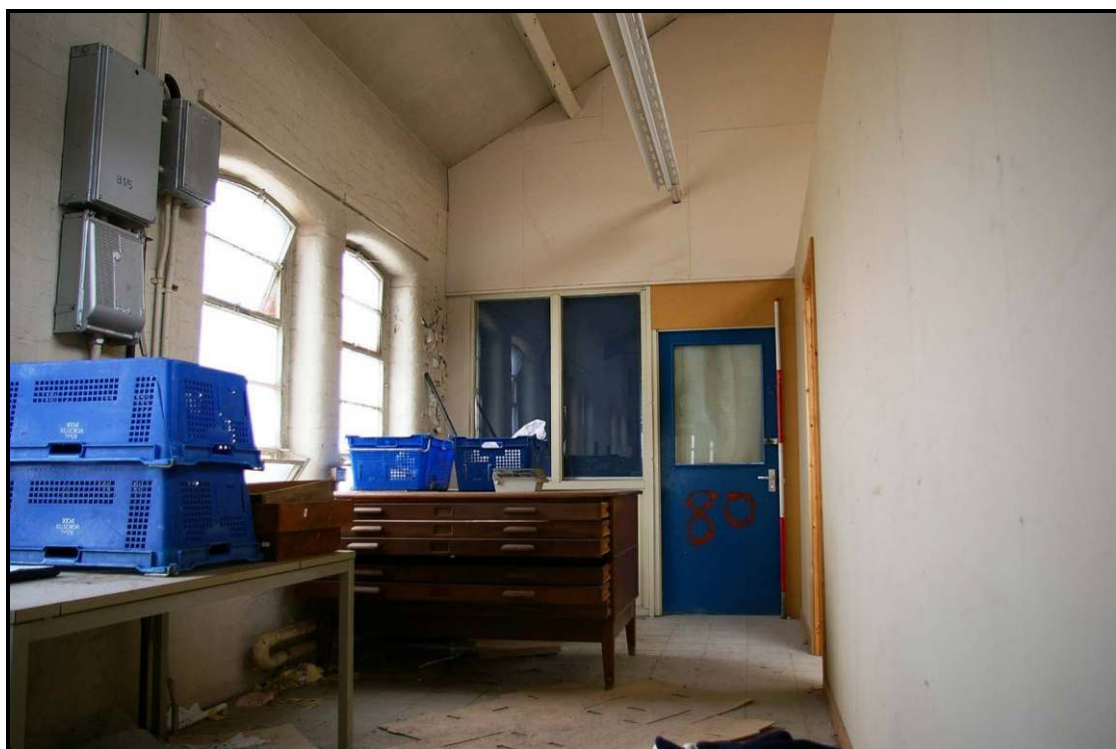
First floor of Building R, looking towards the darkroom in the southern end
